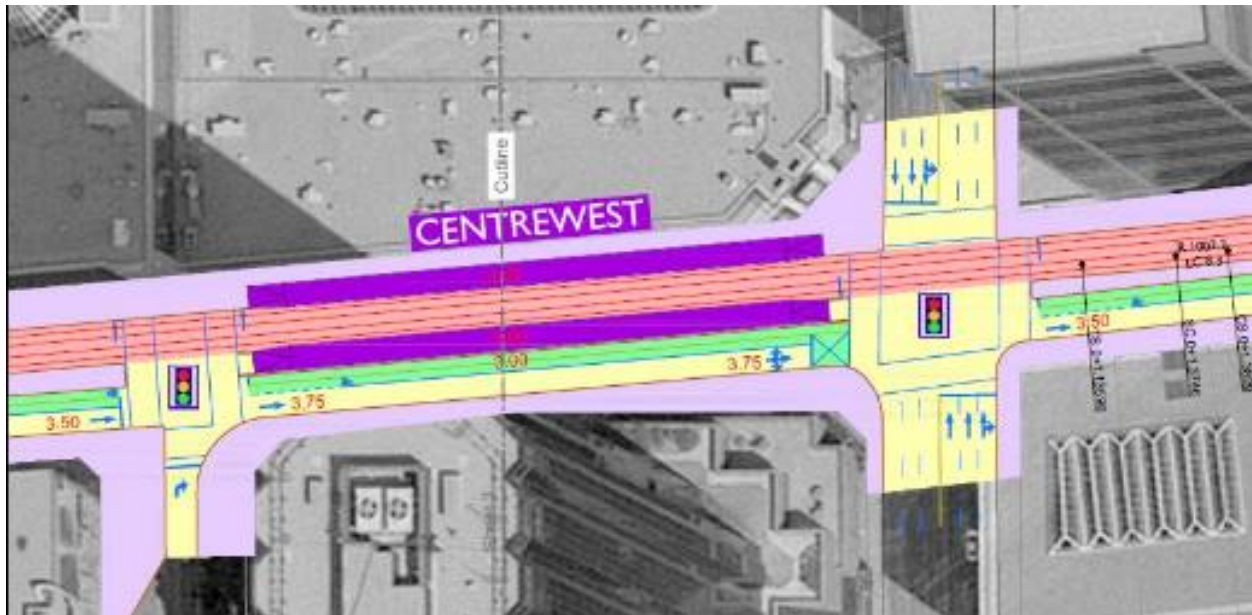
Concept Plan for CentreWest Station between 101 and 102 Street, which was renamed as the 102 Street Station (*Downtown Corridor Selection Report*)
